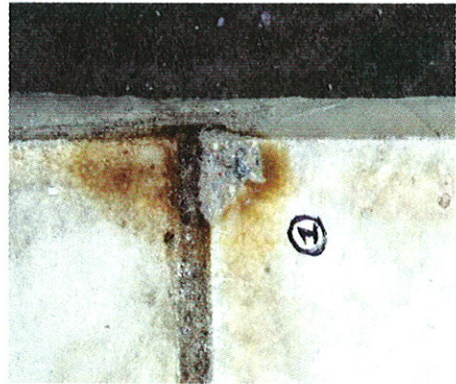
Concrete tiles, Roof of coffin crematorium building (Sample No. B/261/06/1)
